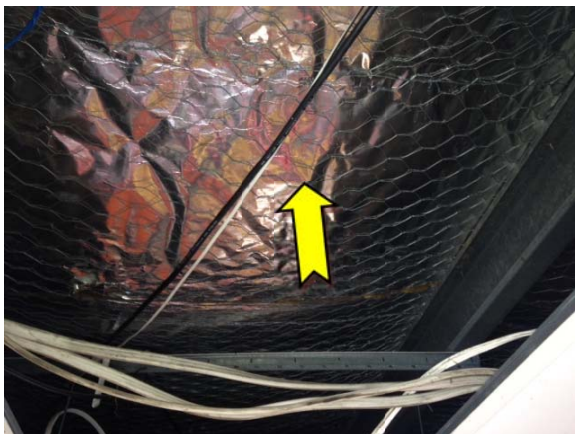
Ground level, throughout roof space – SMF sarking insulation
